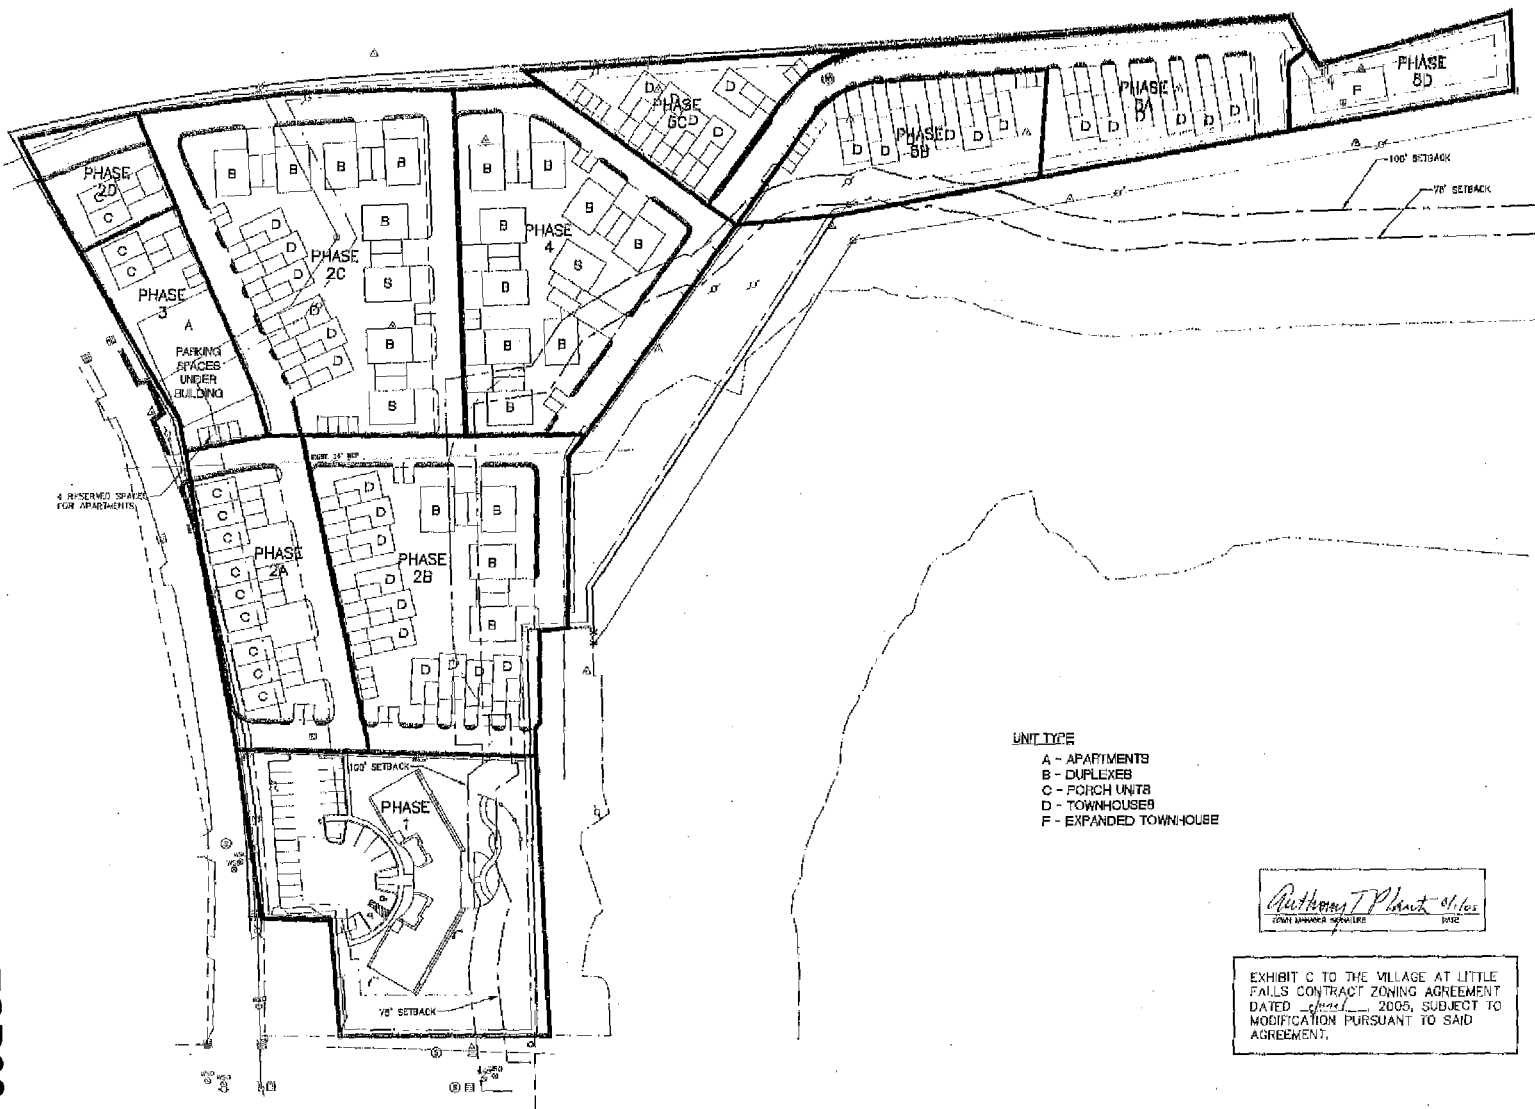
EXHIBIT C - CONTRACT ZONE PLAN (SITE)
